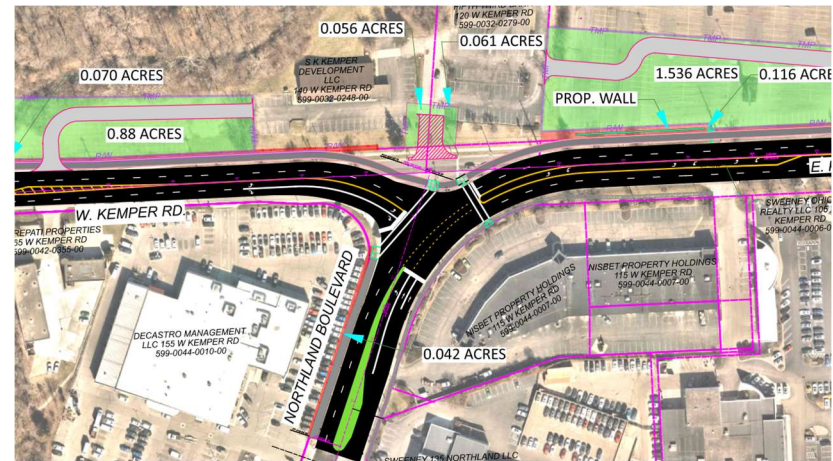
Draft plan of Kemper & Northland intersection improvements.
